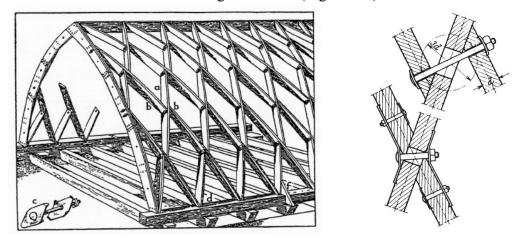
Diagram of the roof with the Zollinger system and its connection details
